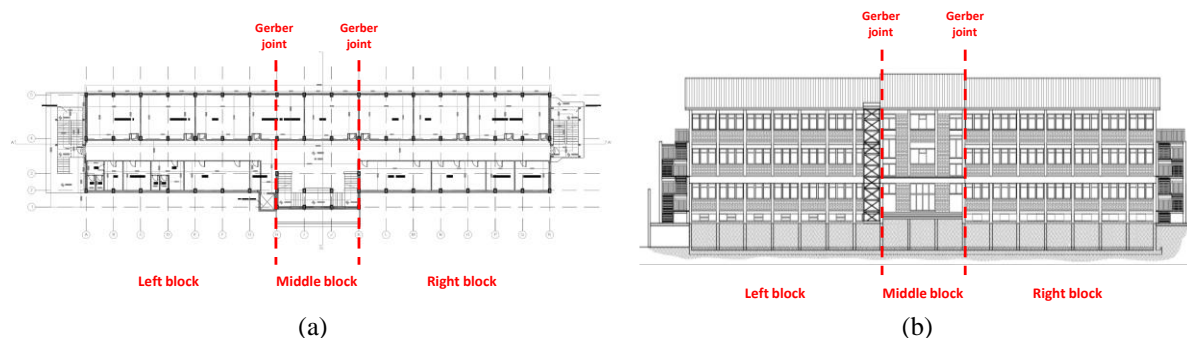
De Gasperi-Battaglia school building: (a) plan layout of 2nd and 3rd floor, (b) north front view
